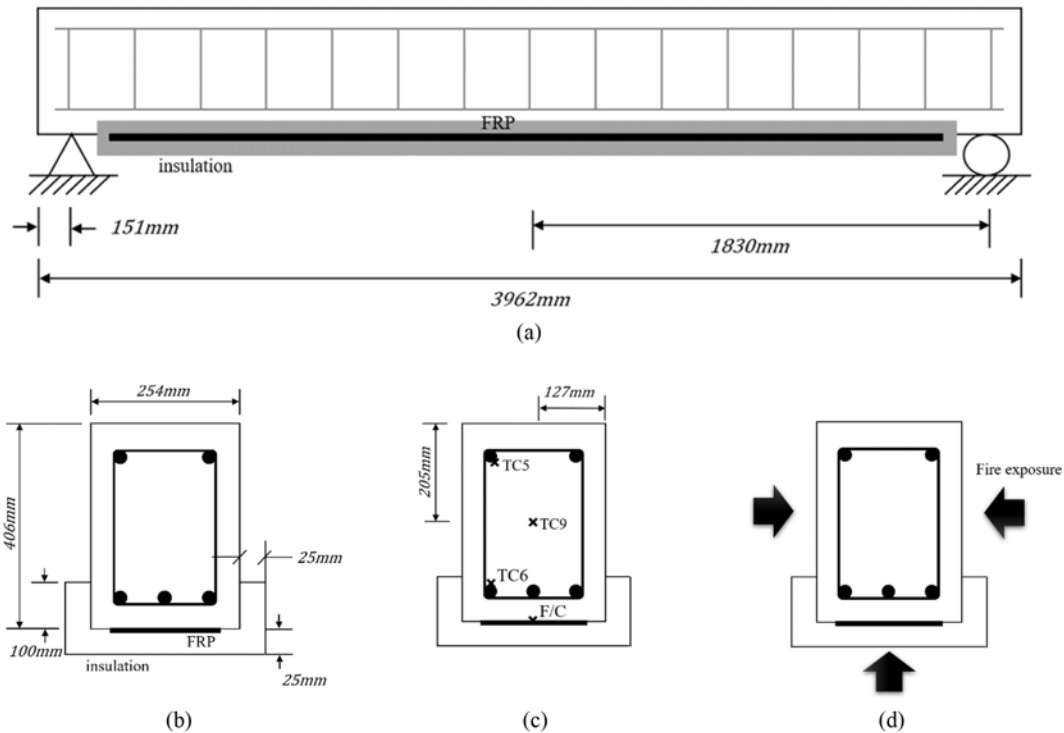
Details of the FSRB: (a) Elevation, (b) Beam Cross-Section, (c) Thermocouple Position, (d) Boundary Condition
